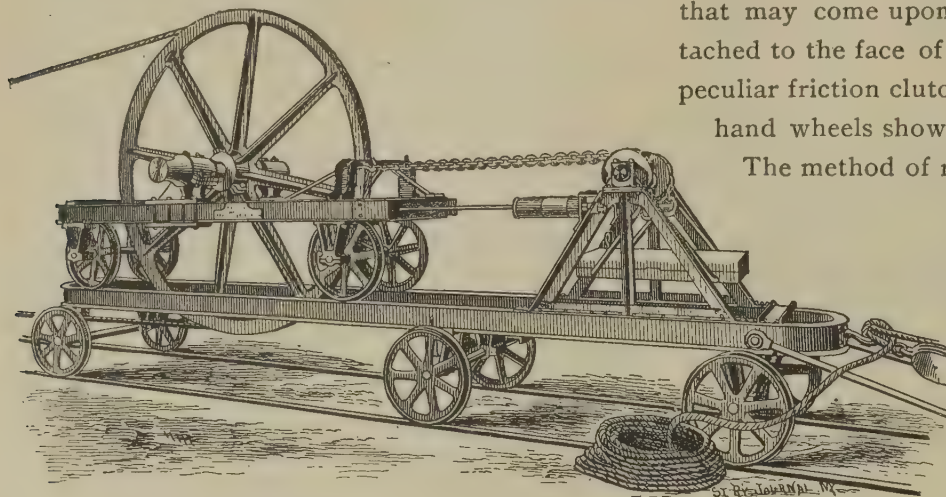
DOUBLE TENSION CARRIAGE—SAN DIEGO CABLE TRAMWAY.
